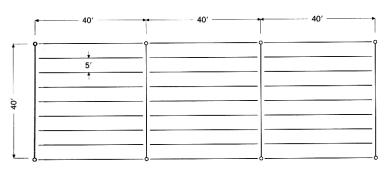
Framing plan for joists, girders, and columns on 40 ft  $\times$  40 ft grid.
